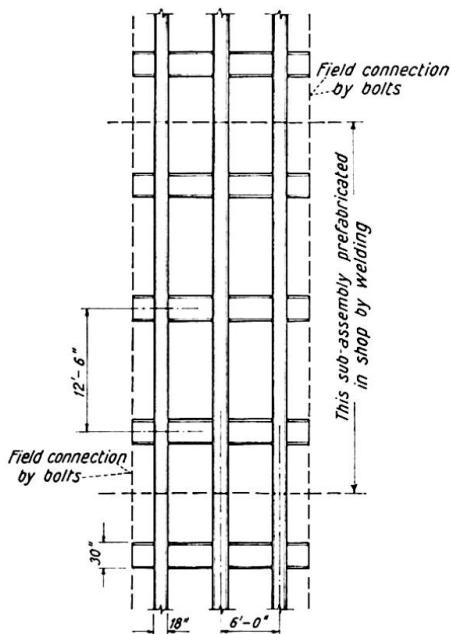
Prefabricated Units for Framed Tube Type Structures
